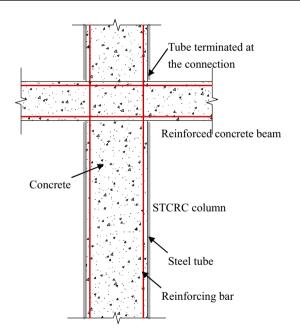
Schematic view of the STCRC column and its beam to column connection.
